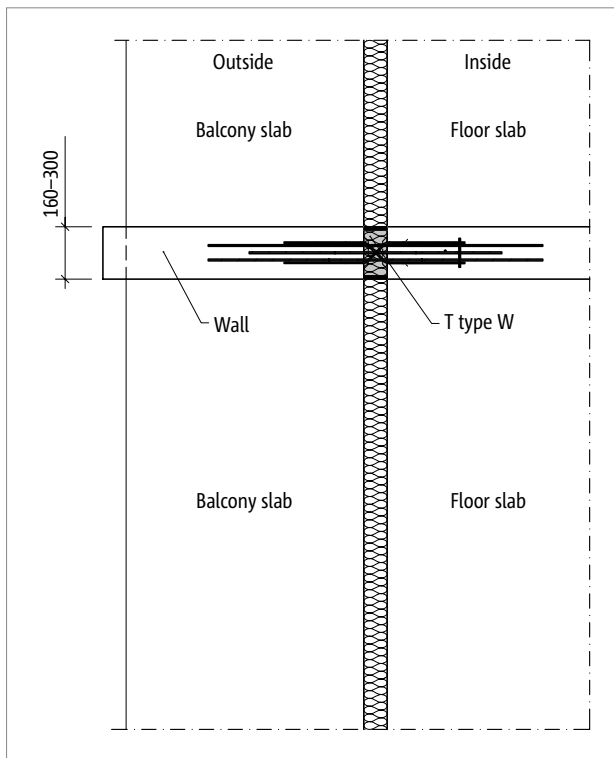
Schöck Isokorb® T type W: Layout; Balcony structure with thermally insulated load-bearing shear walls
